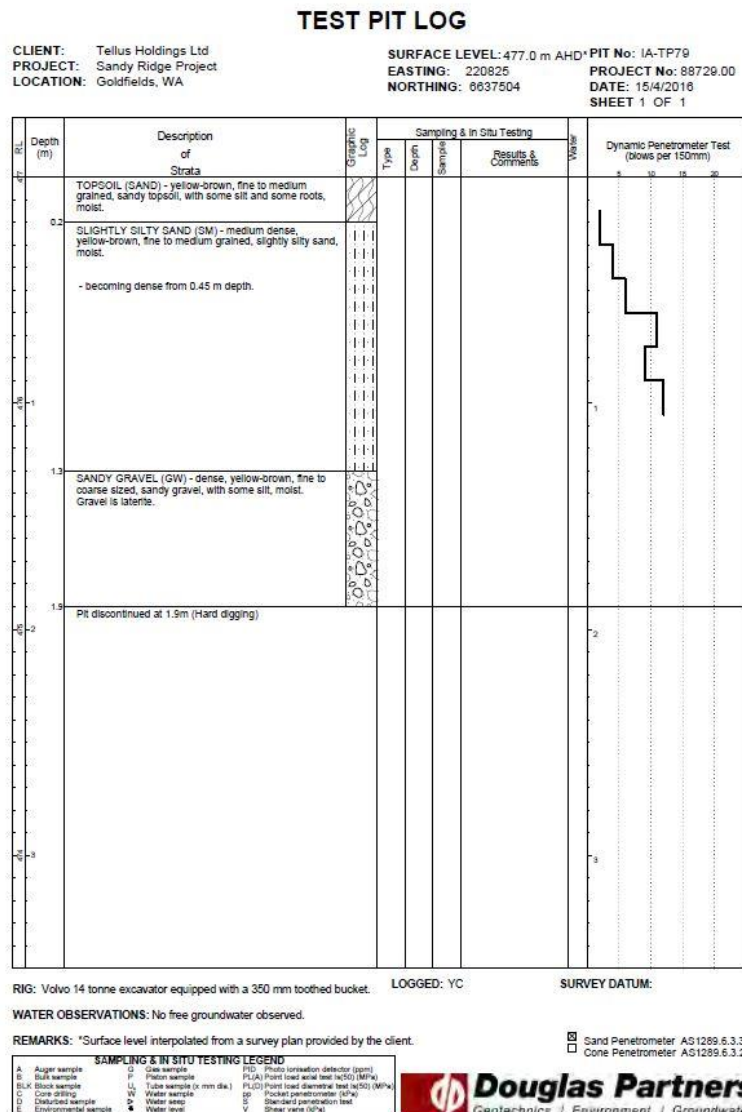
Typical test pit log within infrastructure area at the Sandy Ridge Facility.
